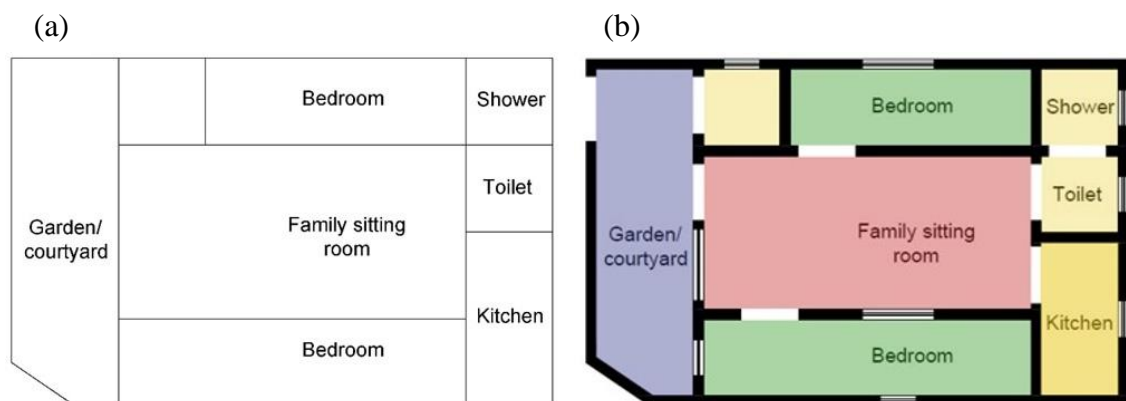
Zaatari camp- Females- Group 3: a) Zoning of spaces, b) Plan with openings
